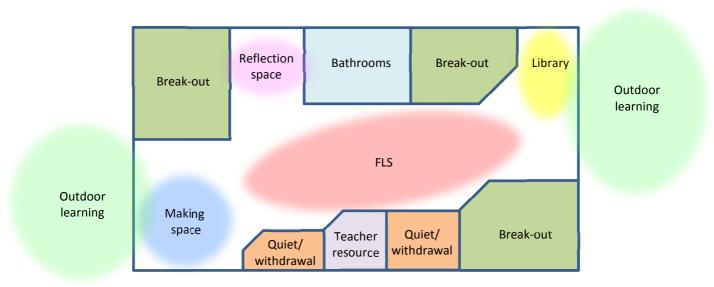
Example of a rectangular ILE shape, using an asymmetrical floor plan to 'break up' the space
